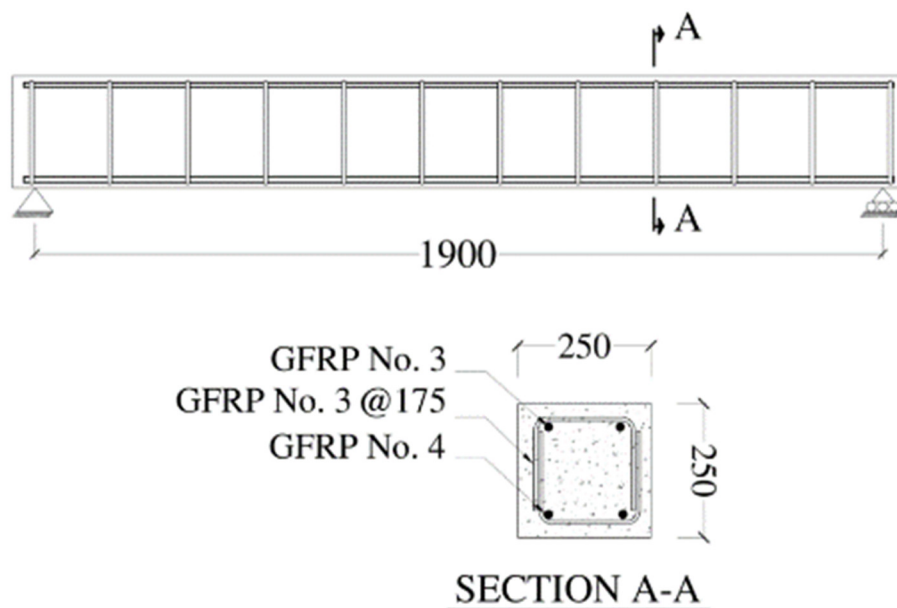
Geometric and reinforcement details of the test specimens (all dimensions are in mm)
